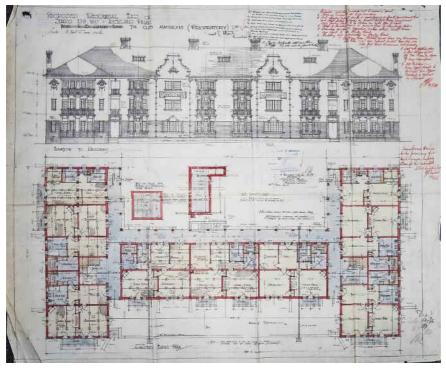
Original plan for proposed residential flats along Kingsway Avenue from 1928_ plans were drawn by the well-known architect P. Rogers Cooke (Source: City Council of Johannesburg, Plans Archive)
